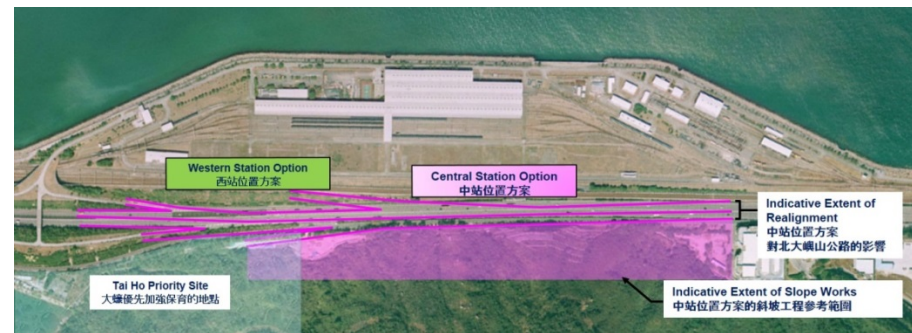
Potential Construction Works within Tai Ho Priority Site
